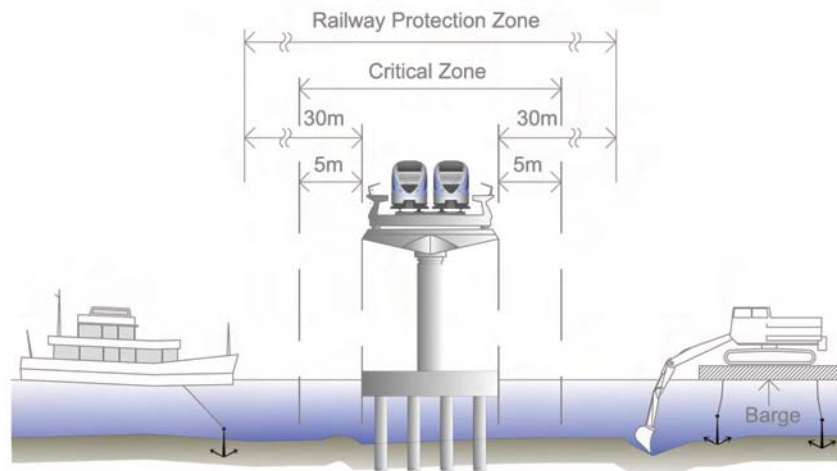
Anchoring of vessels and dredging should be outside the Railway Protection Zone for bridges
